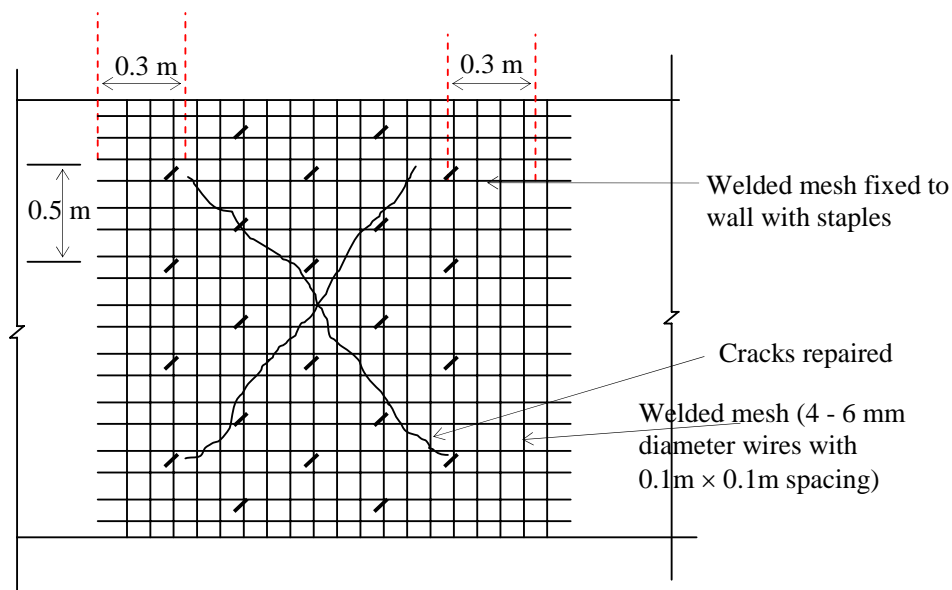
Repair of heavily cracked masonry wall using welded mesh and staples
